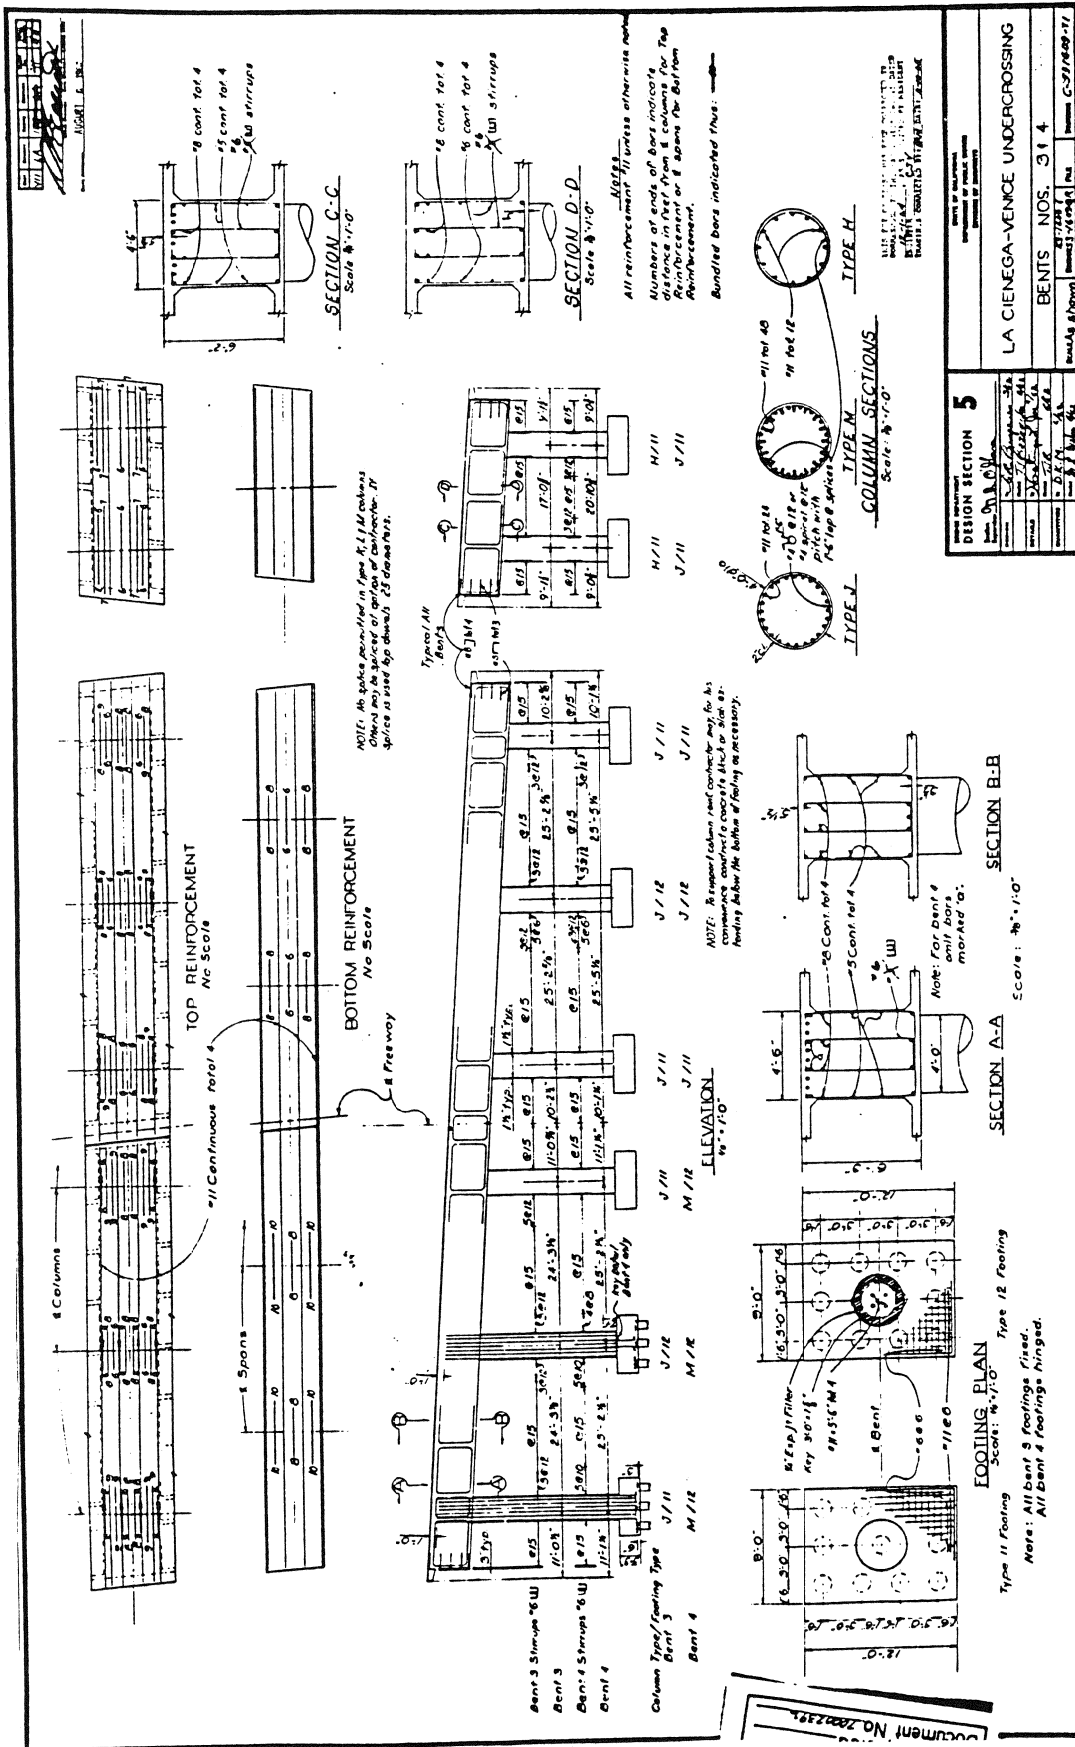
La Cienega-Venice Undercrossing - Bents 3 and 4 Details
